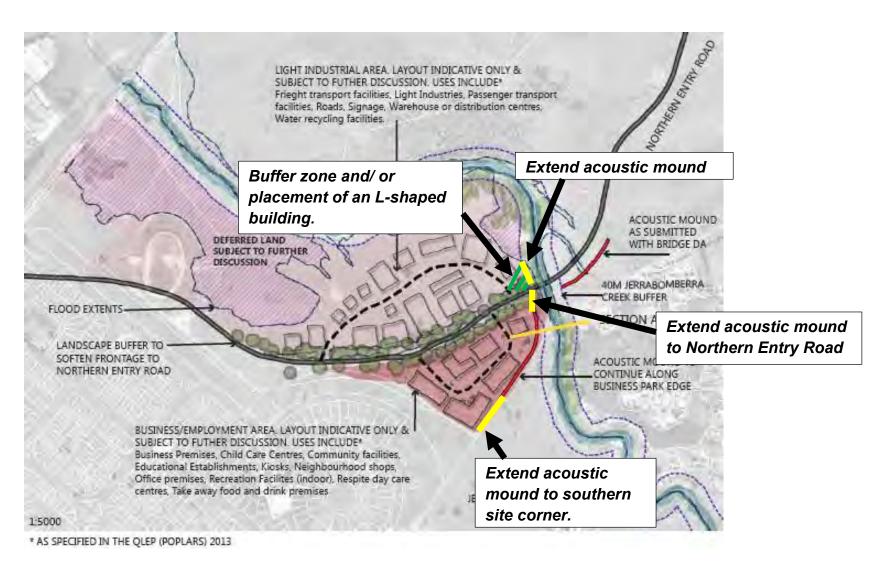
| Renzo Tonin recommendations to Proponent's Concept Plan
